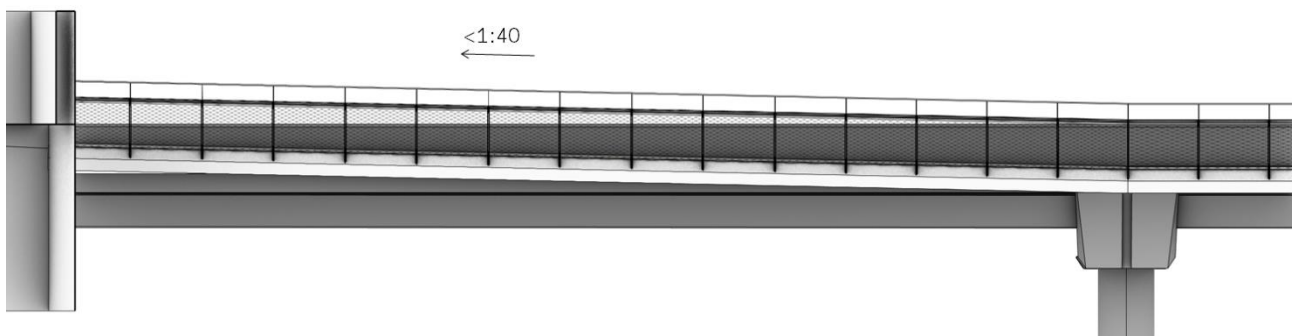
Elevation diagram showing footway gently ramp up to meet active travel path at abutment
